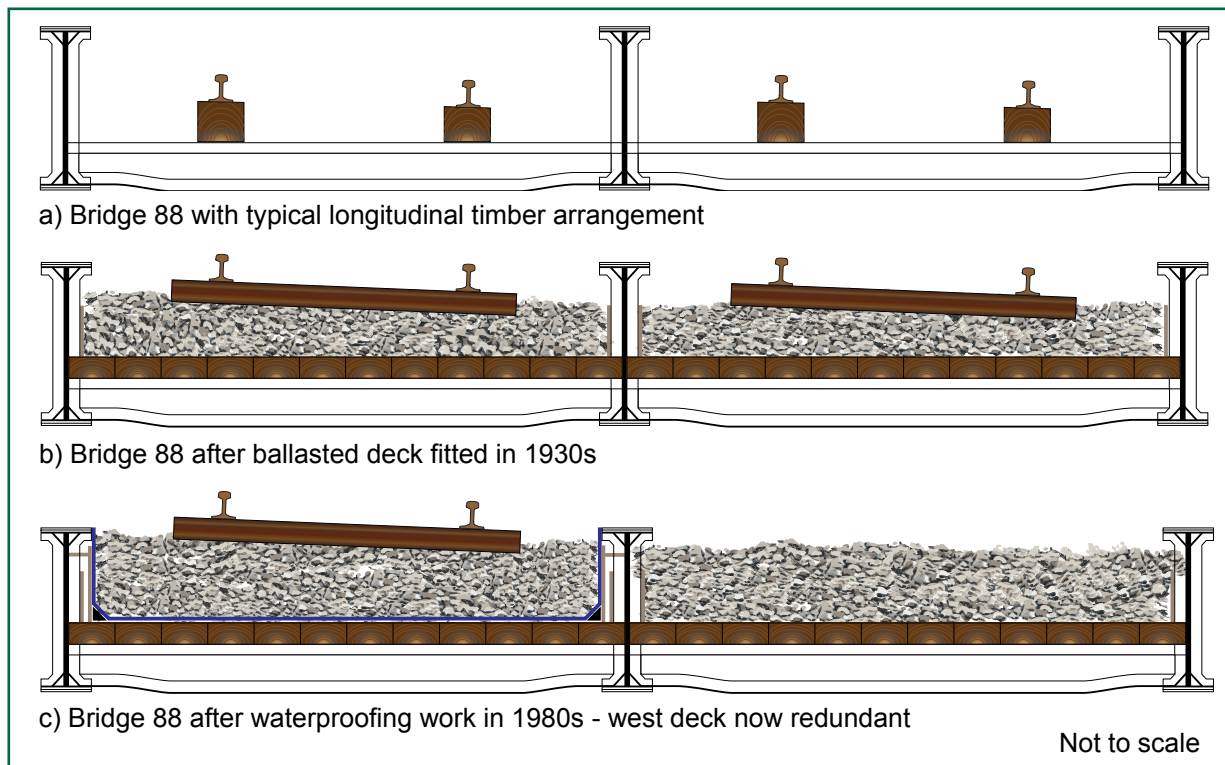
Cross-section of the deck of Bridge 88 showing the modifications made since it was constructed
